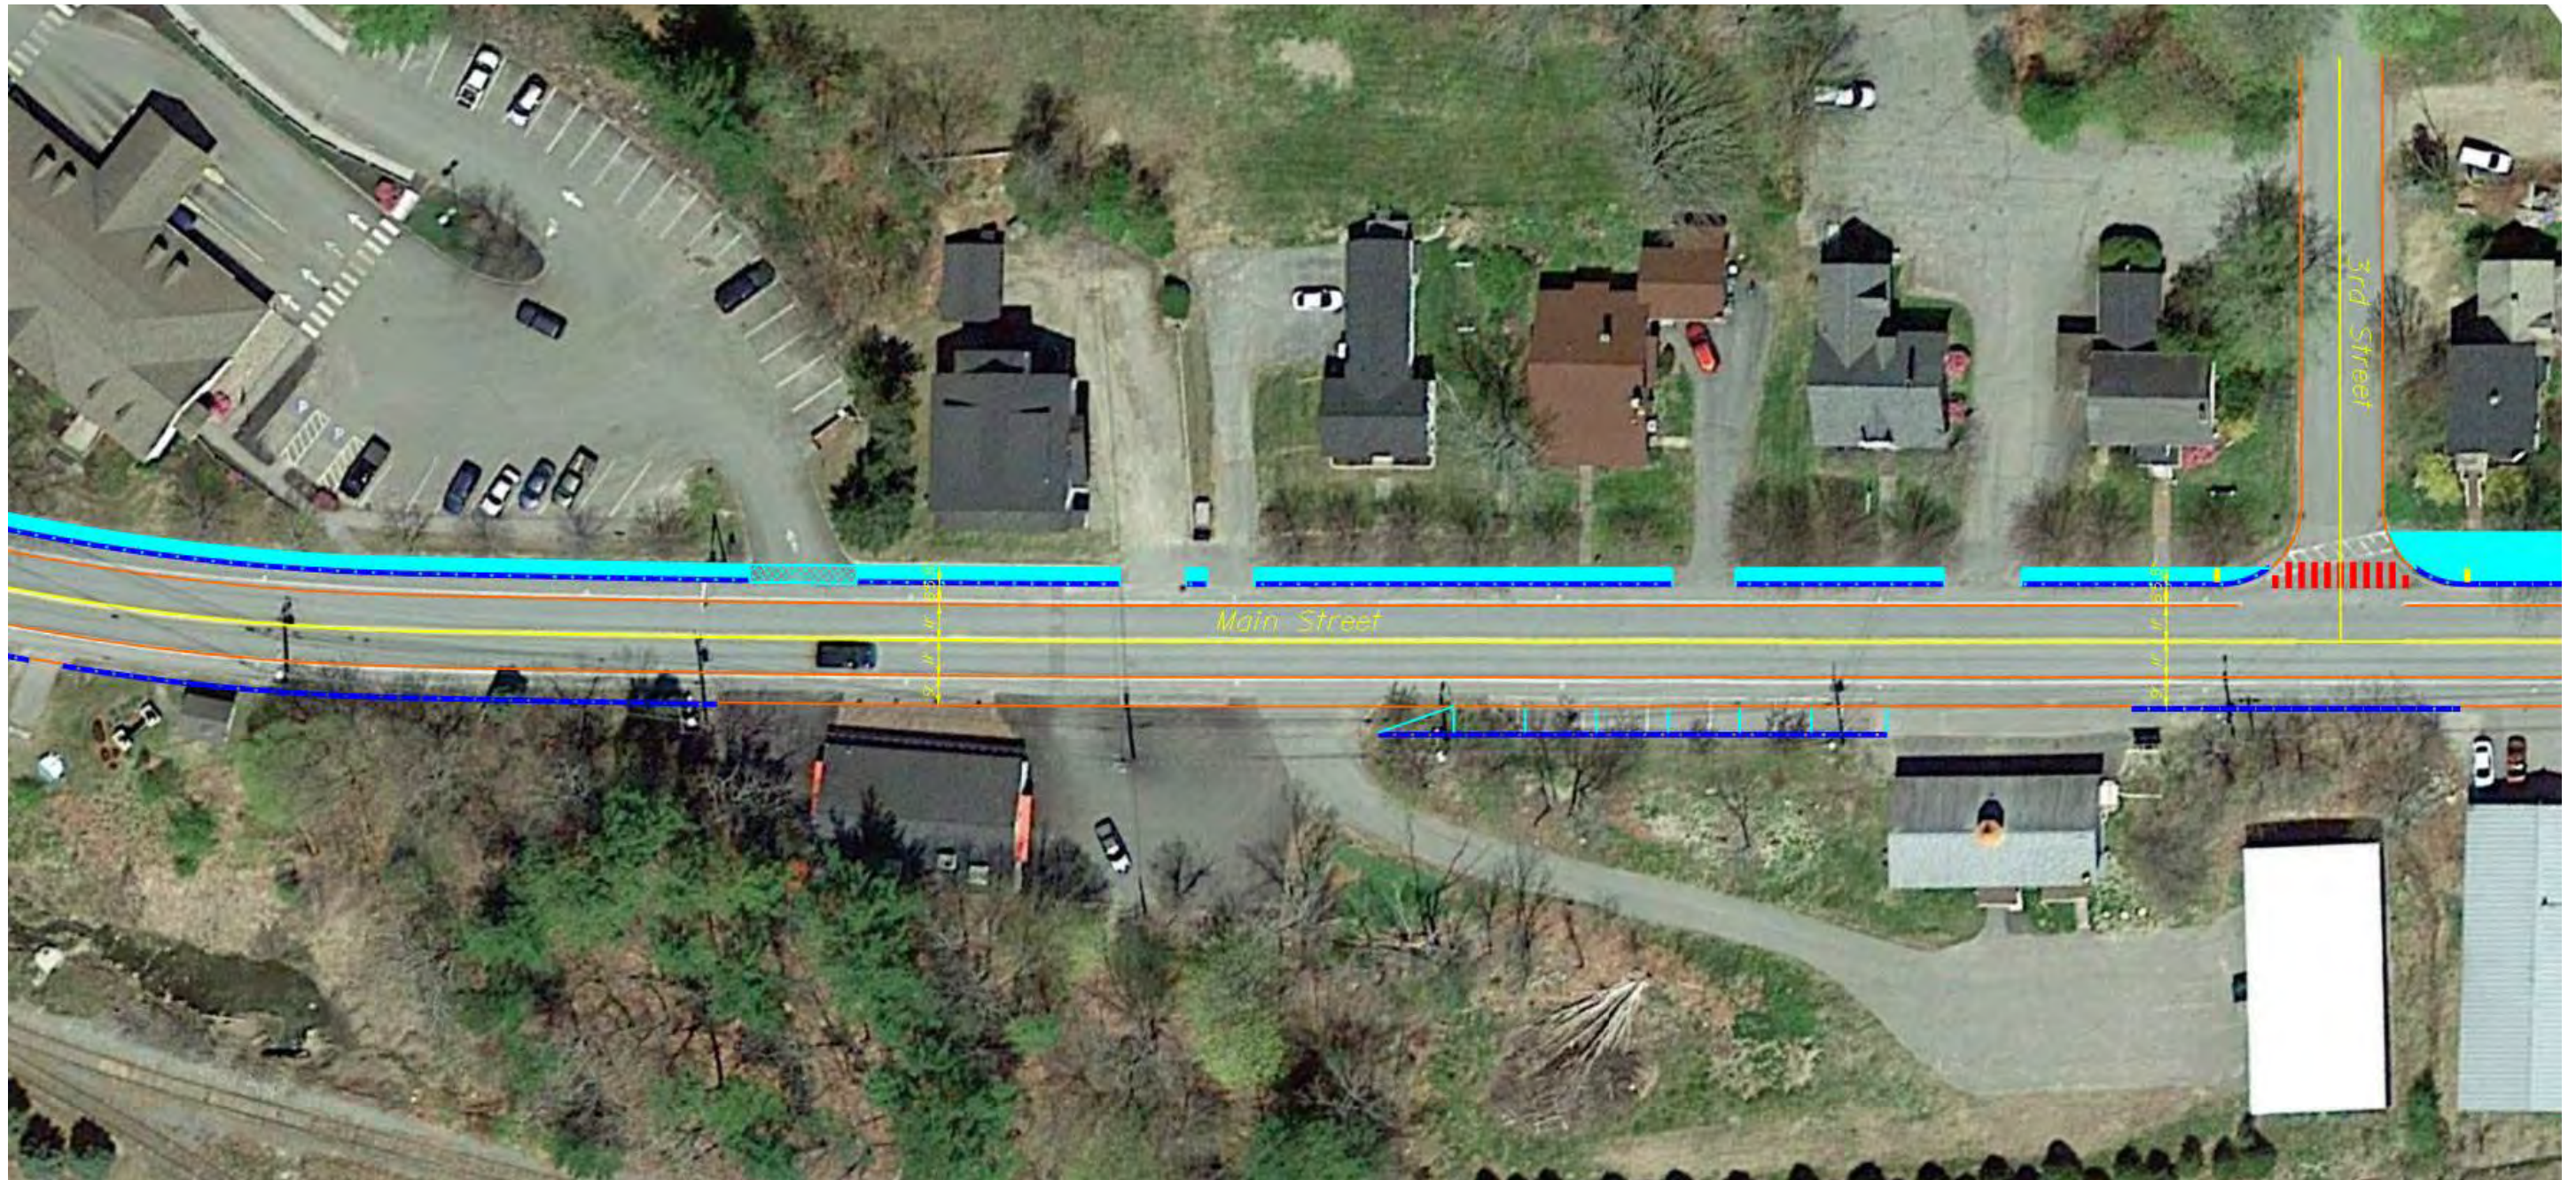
Main Street Improvements from 3rd Street toward Franklin Street
